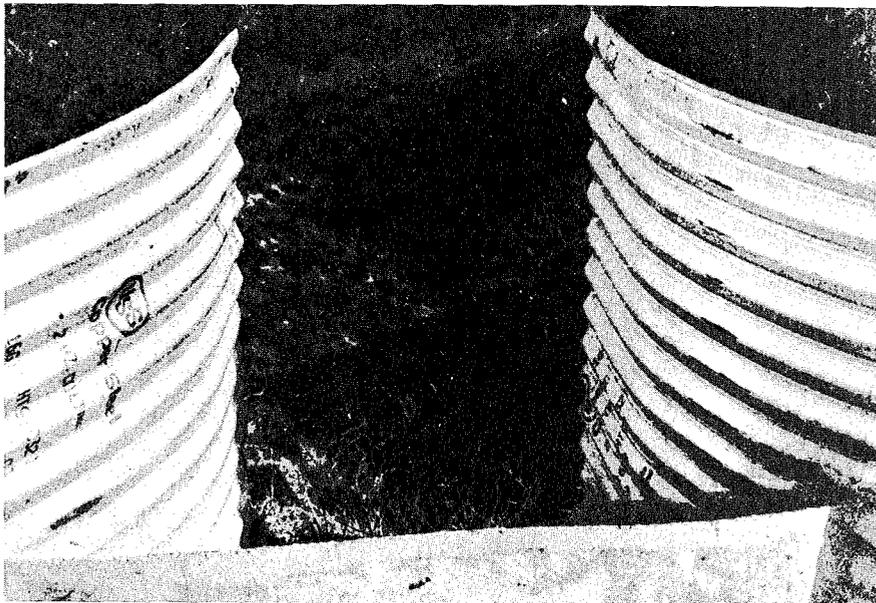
Throat of inlet. The cutoff plate and bottom of inlet throat will be of a single piece of sheet metal in future structures. A machine break will replace the welded angle joint used in this prototype model.
